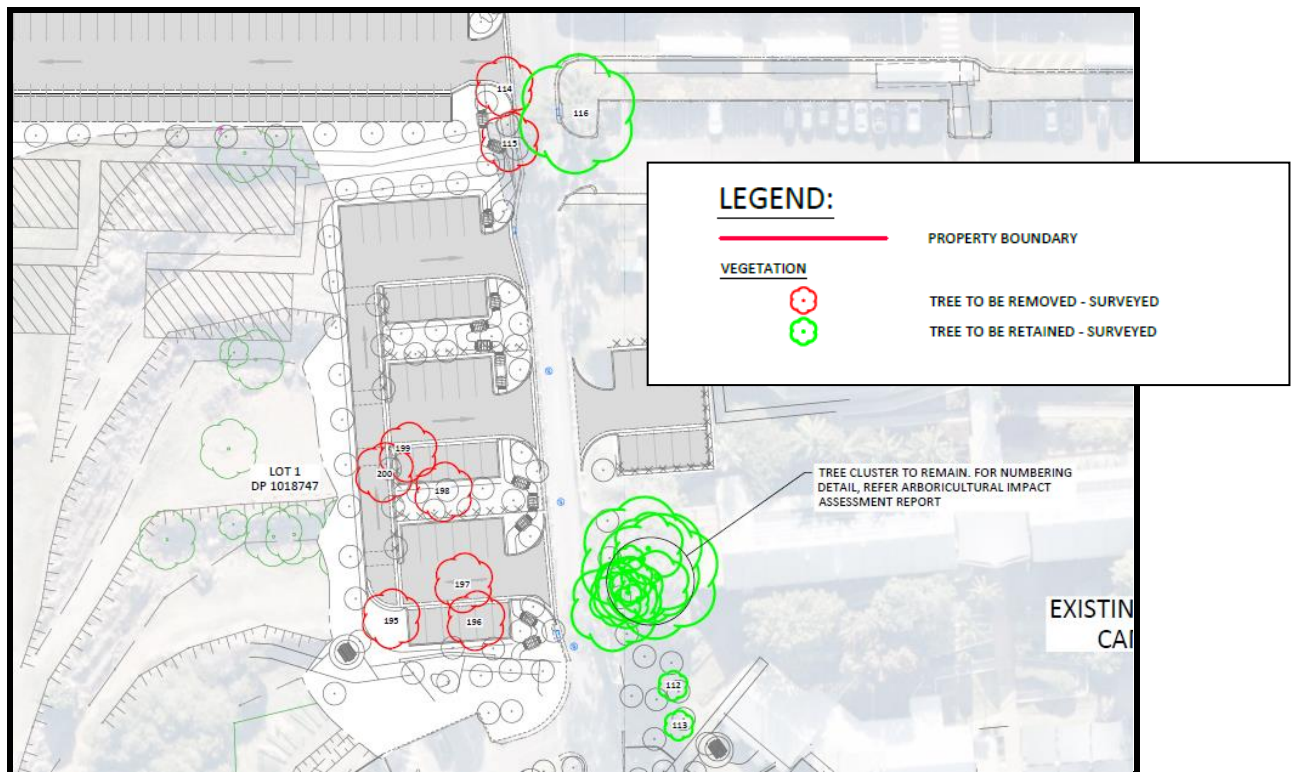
Proposed Tree Removal Plan (Source: NDC, 23 February 2023)
